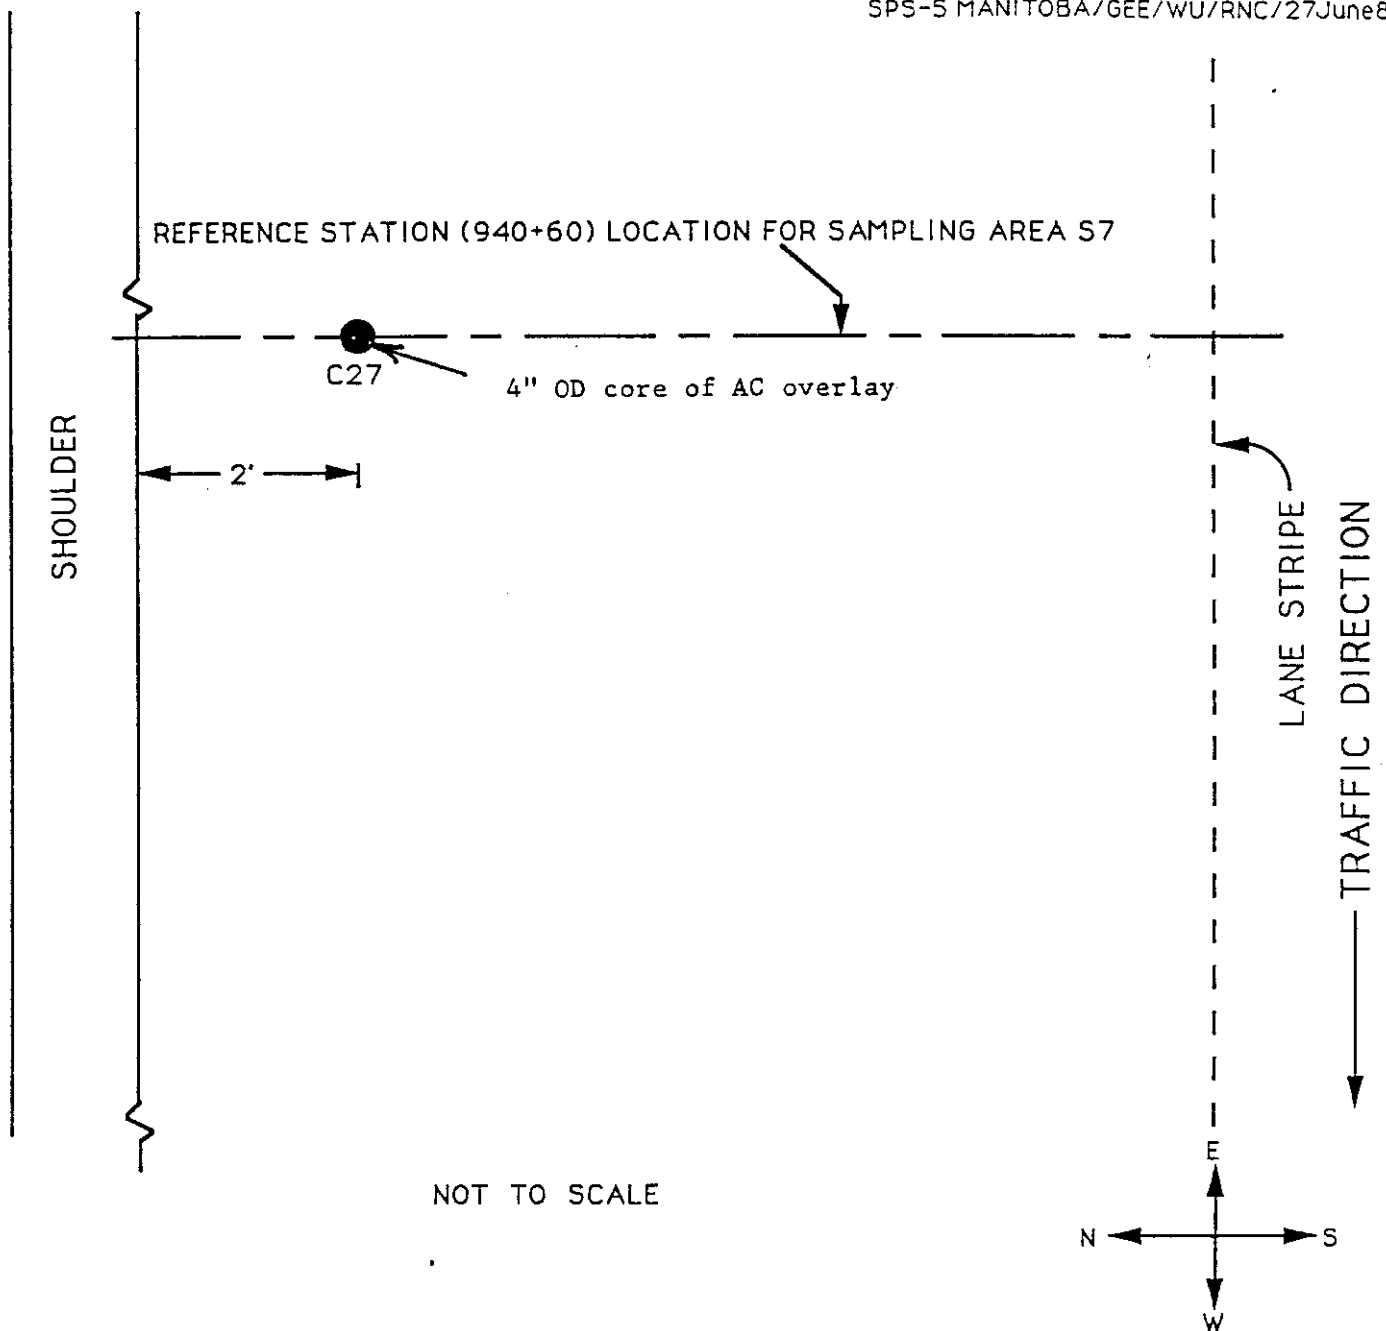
After overlay sampling plan for station 940+60 before section 9. Sampling area S7.
